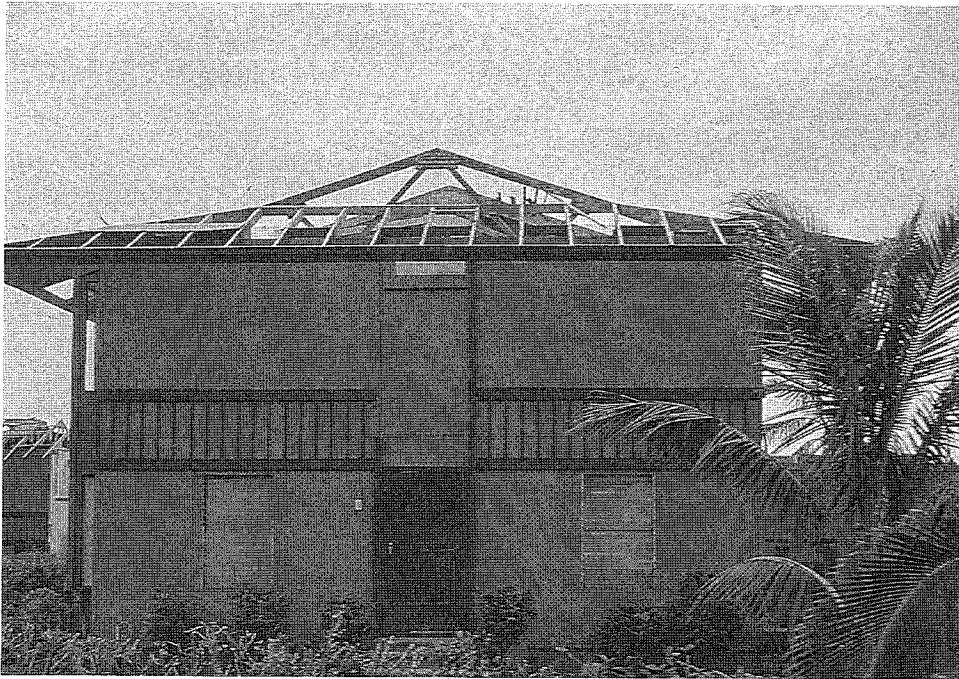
Severe loss of plywood roof sheathing indicating inadequate connections.
